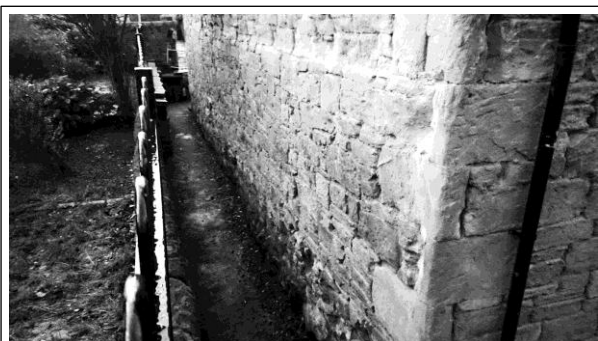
Photograph of Excavated Side Garden to South of Dwellinghouse
